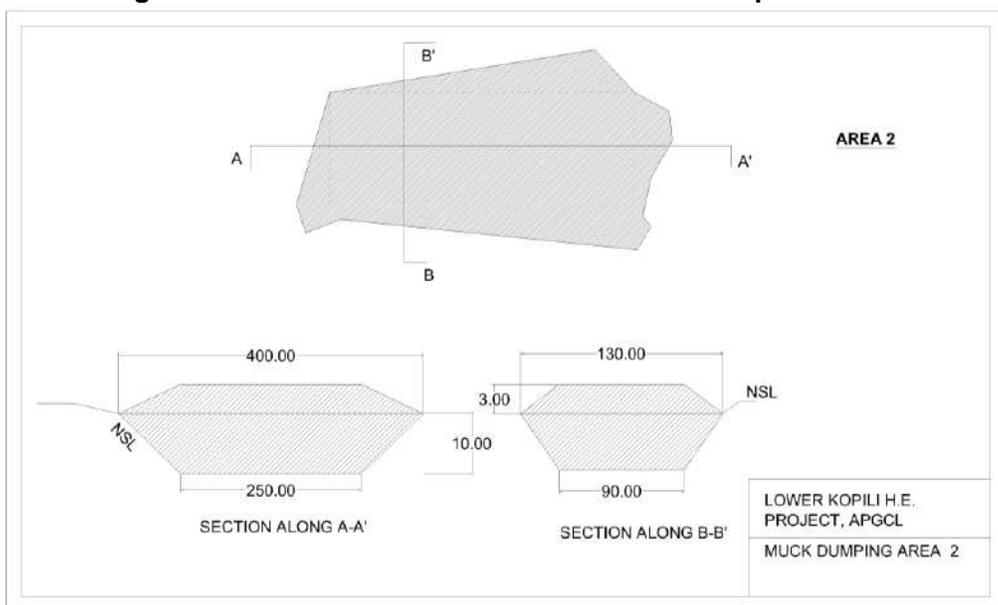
Plan and Cross-Section of Muck disposal Site-2
